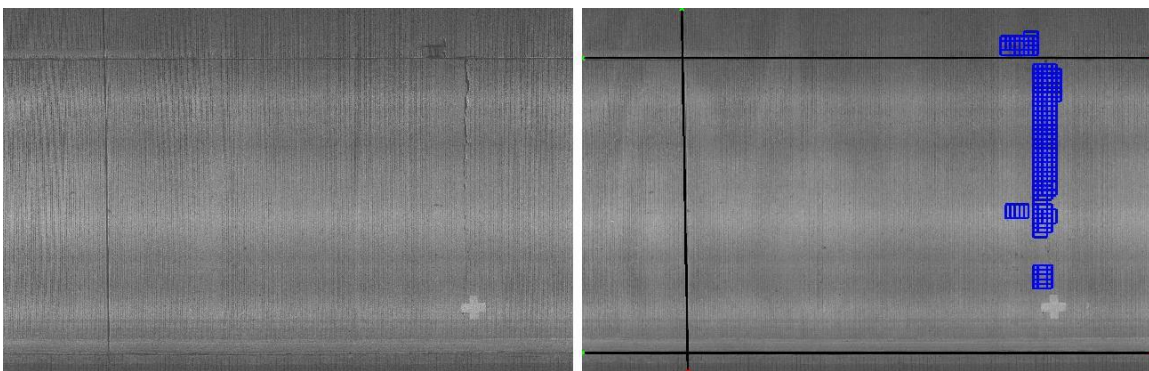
Example 2 of concrete crack at low severity: raw crack (left) and crack detection (right)
